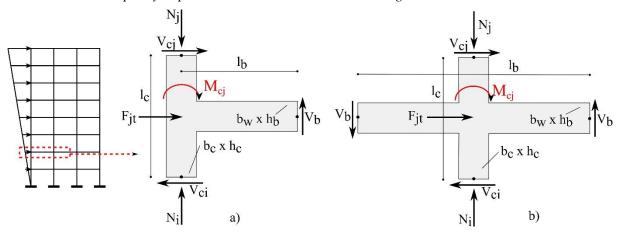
Free body diagram of RC beam column joints in a building: a) External beam column joint; b) Internal beam column joint
